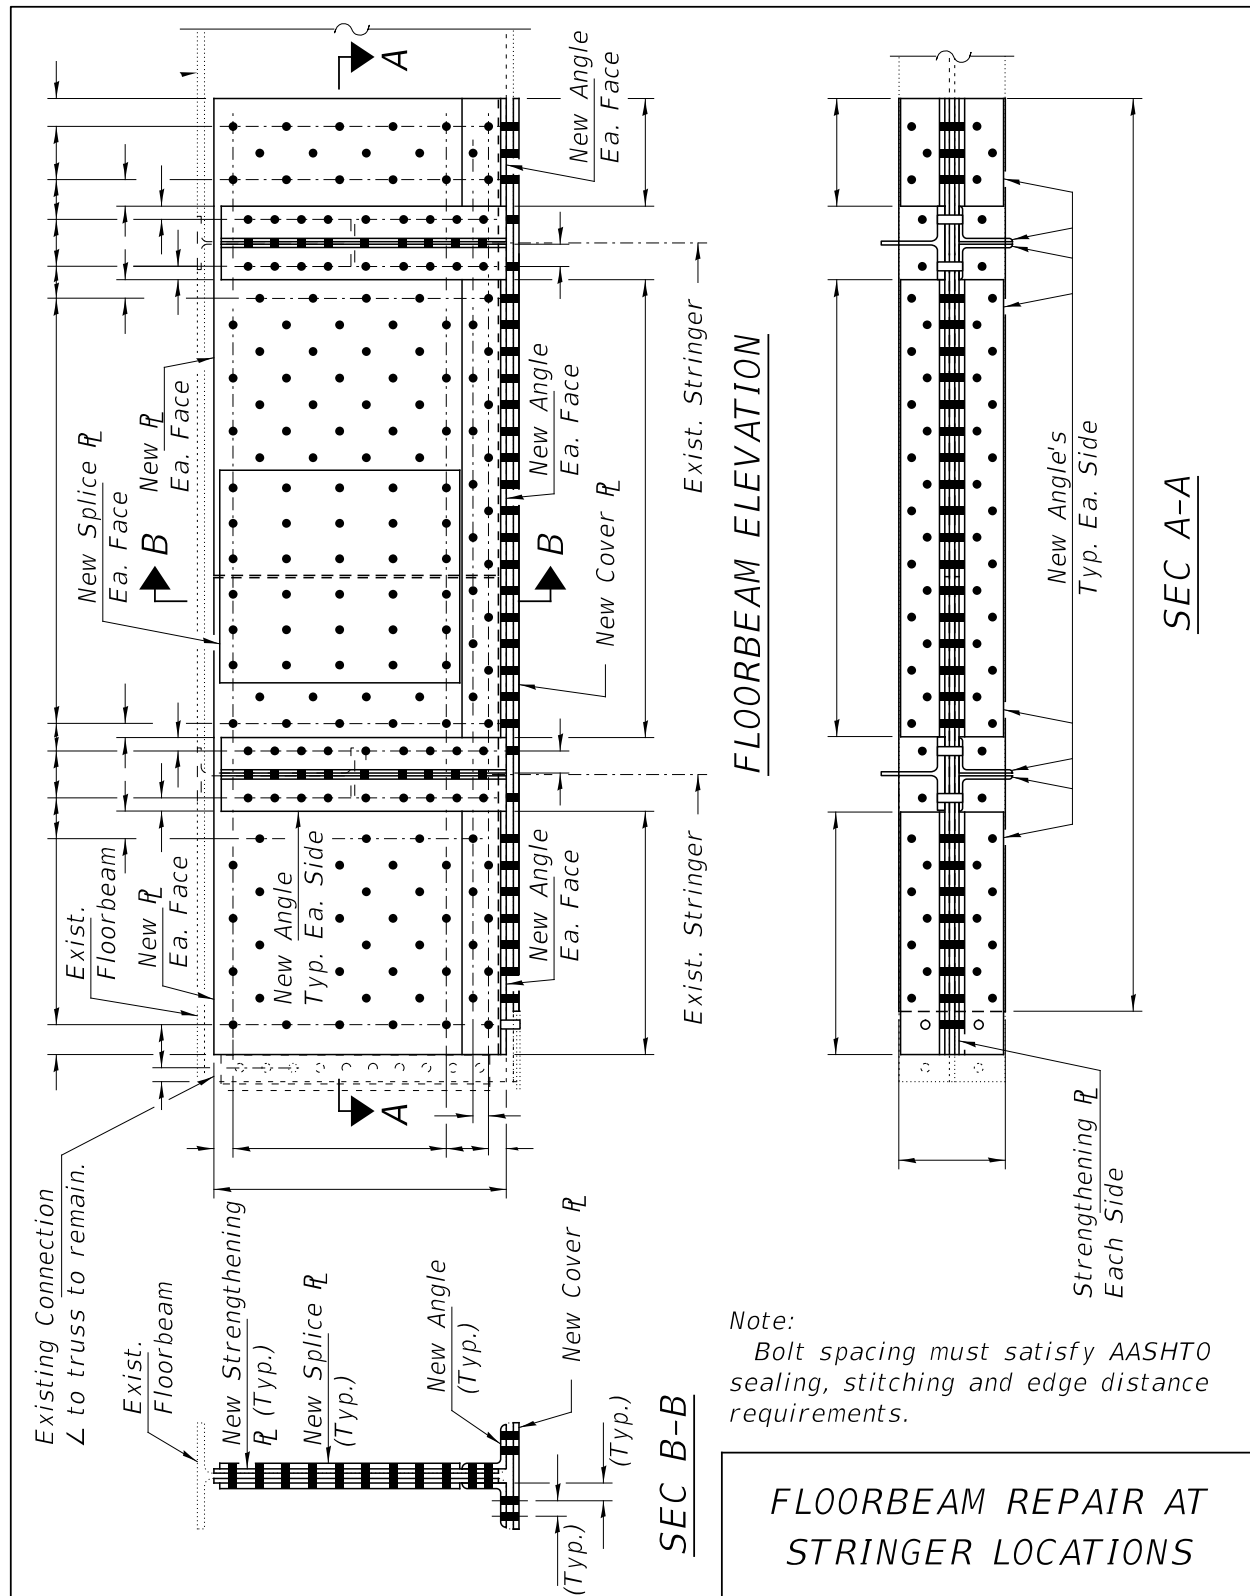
Floorbeam Repair at Stringer Locations
